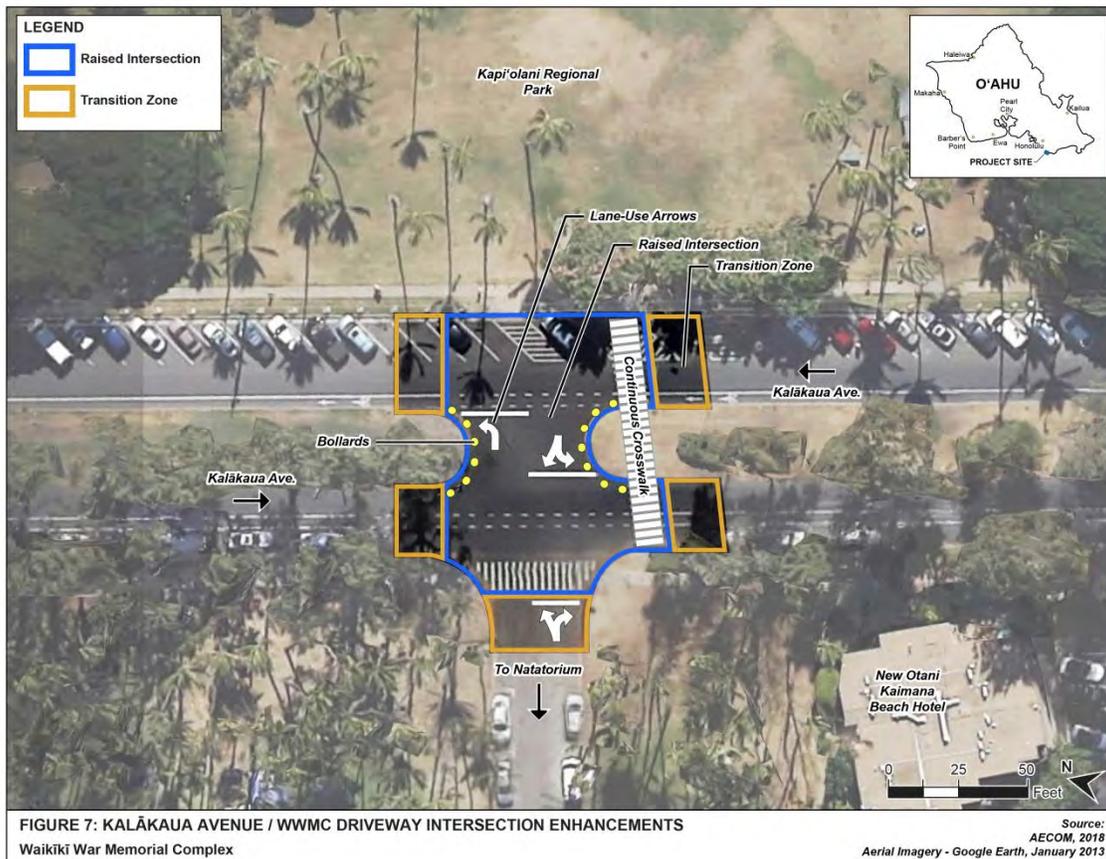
Kalākaua Avenue/Access Driveway Intersection Improvements
